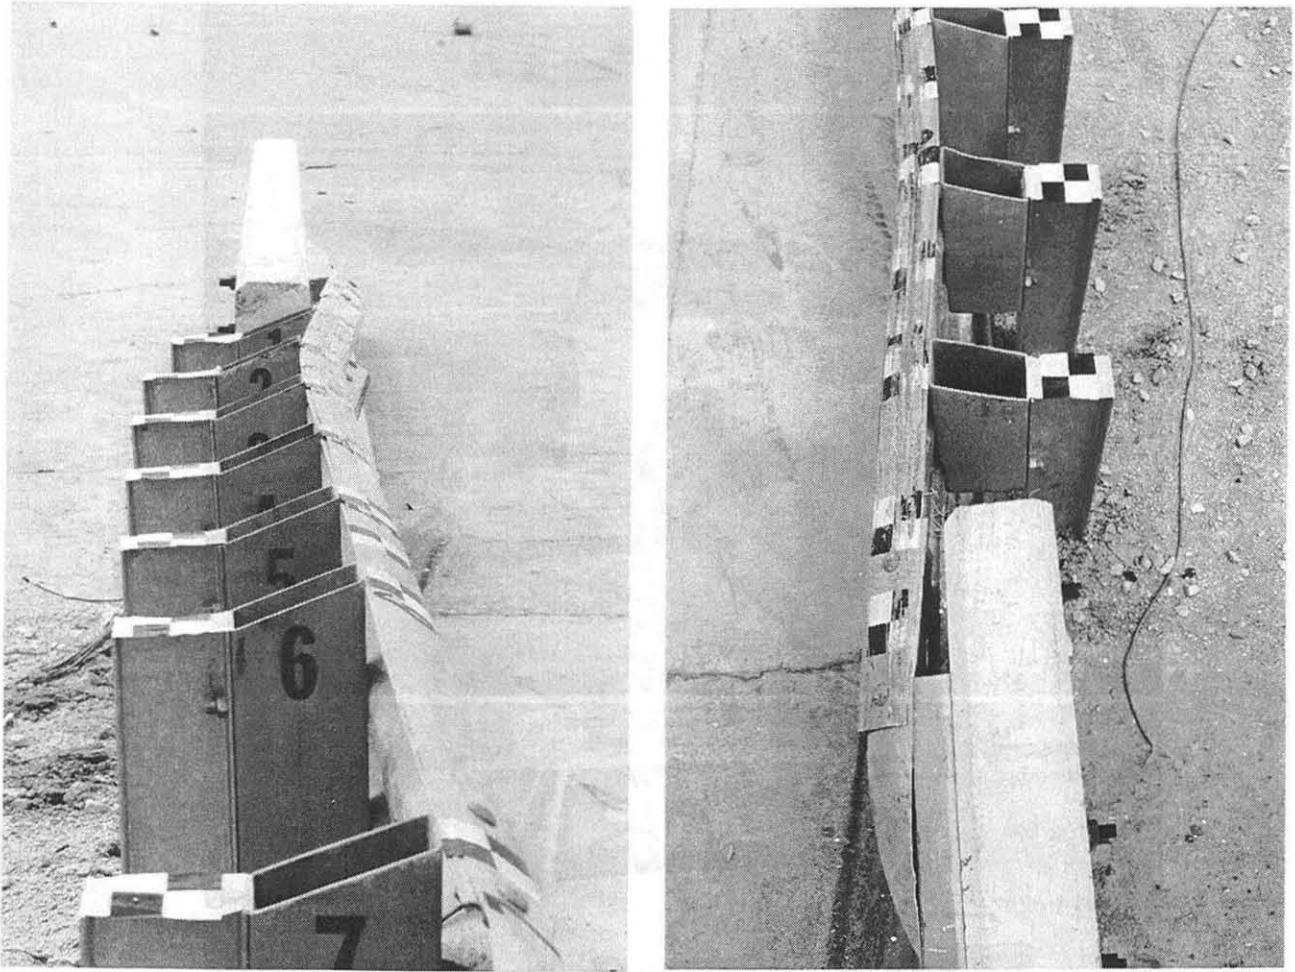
Barrier Damage, Test ITNJ-2 (Design No. 2)
